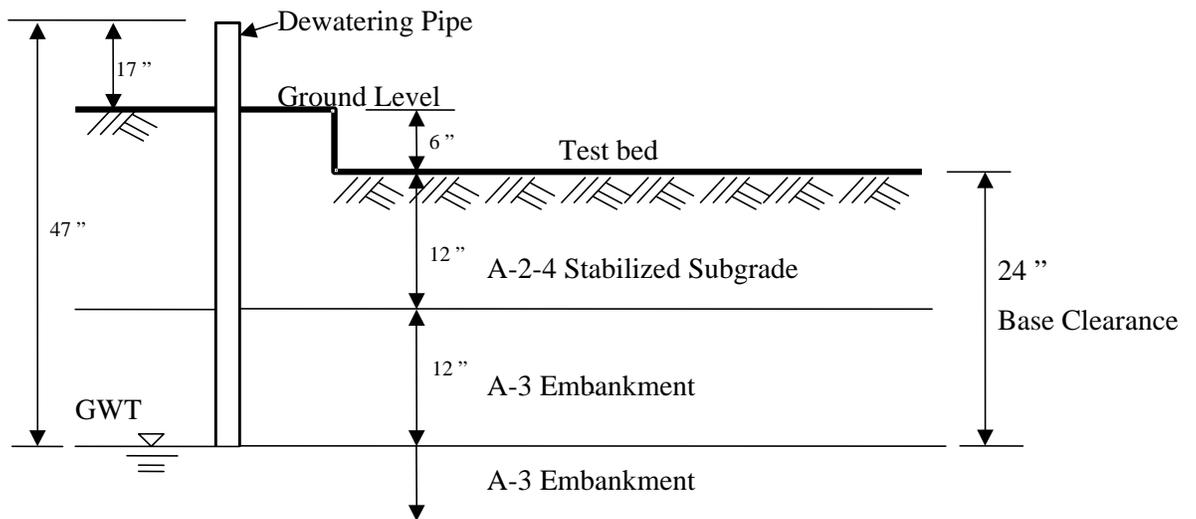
Schematic Sketch of UCF Field Test Site Profile
